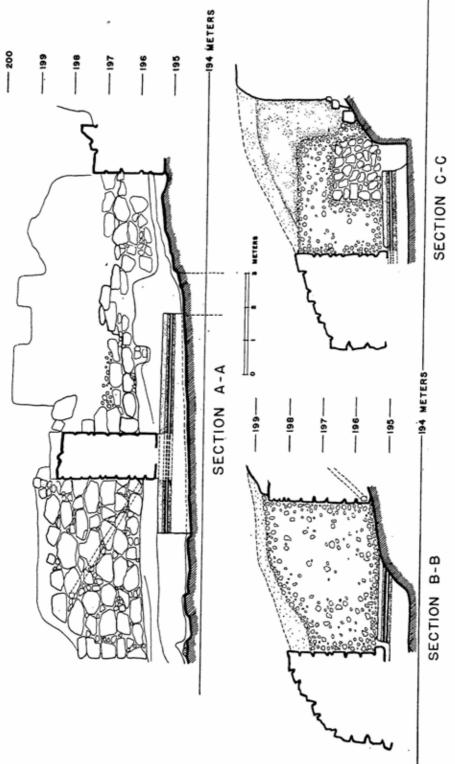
MYCENAE: CYCLOPEAN TERRACE BUILDING, SECTIONS.
